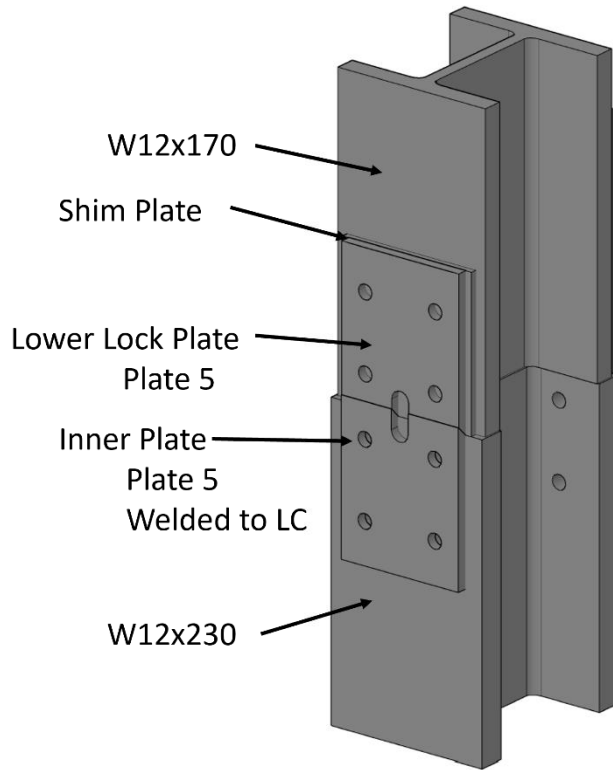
Assembly of the IP welded to the Lower Column, identified as Plate 5.
